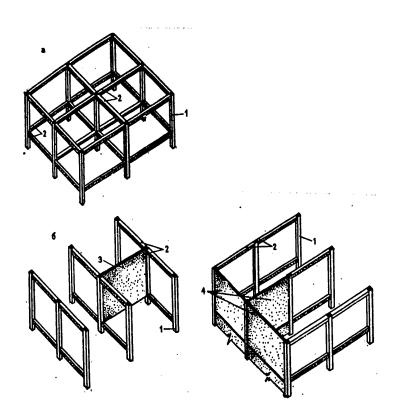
Basic structural diagrams of public buildings. a--Frame with cross-frames; b--frame-connector; 1--columns; 2--collar beams; 3--flat connecting element; 4--three-dimensional connecting element.
